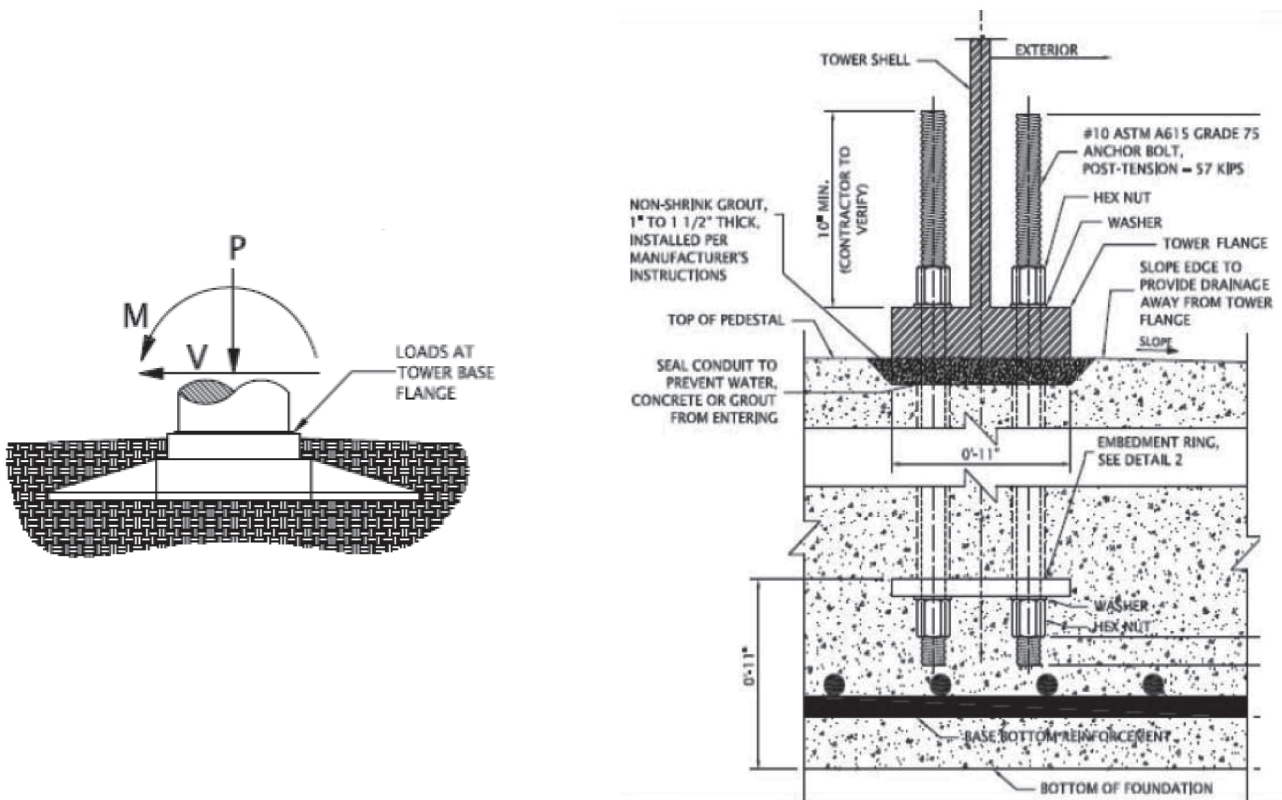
Sketch of wind turbine foundation and tower anchorage to foundation for Example 1.
